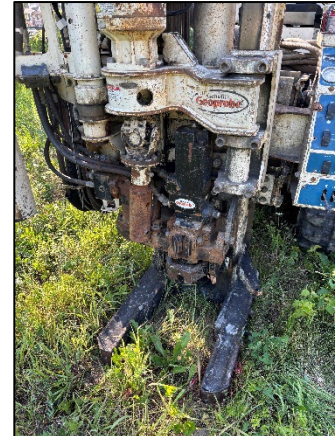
Viewing 14005 SB01 Drilling, Facing Northwest.
